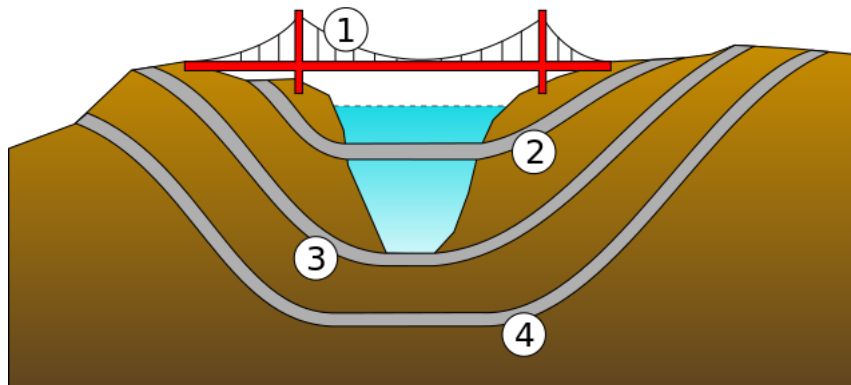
Types of water-spanning structures: (1) Suspension bridge; (2) Submerged floating tunnel; (3) Immersed tunnel; (4) Underwater tunnel (Wikipedia, a)
